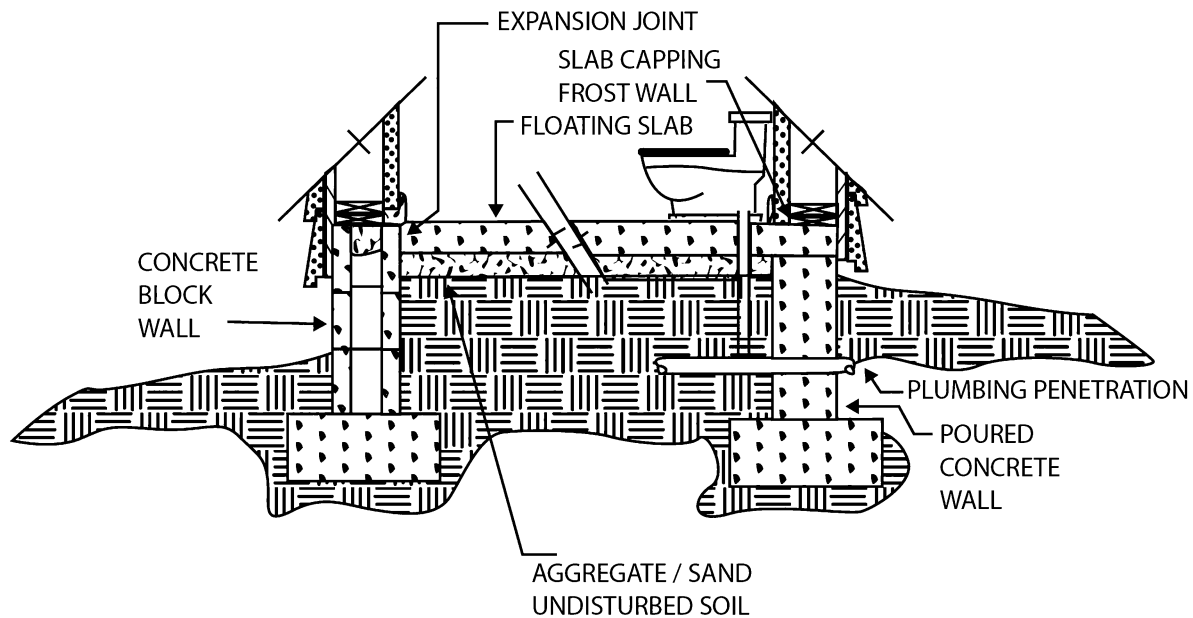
Slab-on-Grade with Stem Wall, Source: EPA
